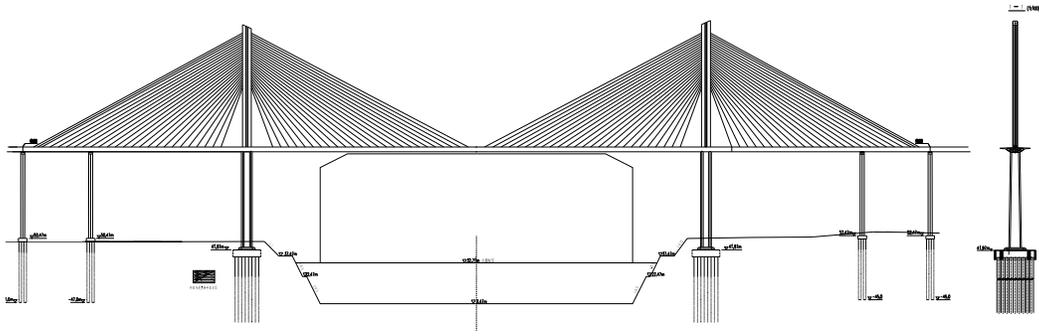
Proposed Pan American Highway Cable-Stayed Bridge Profile
